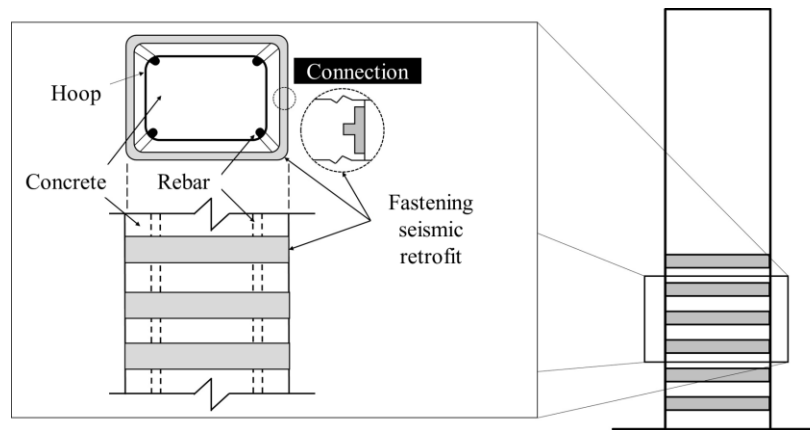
Installation method of a T-type cross-section fastening retrofit
